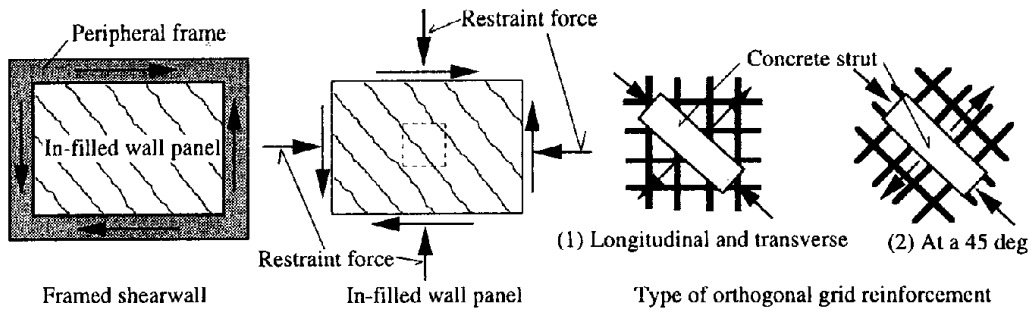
Concrete struts formed in cracked wall of shearwalls and type of orthogonal grid reinforcement
